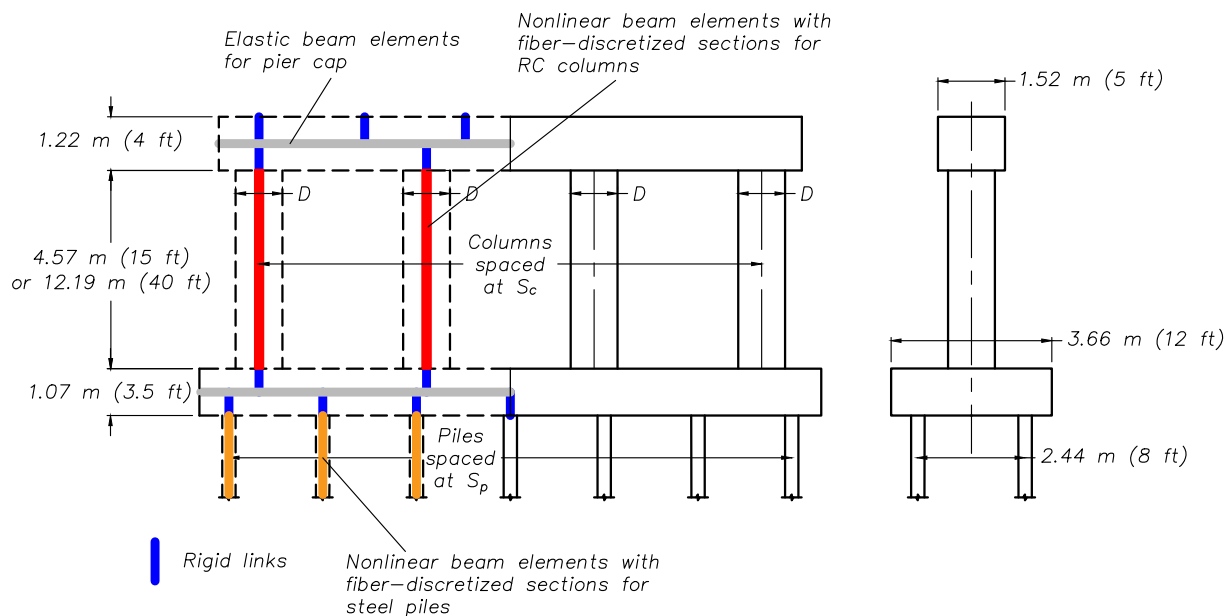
Multi-column intermediate pier substructure and schematic of its finite-element model
